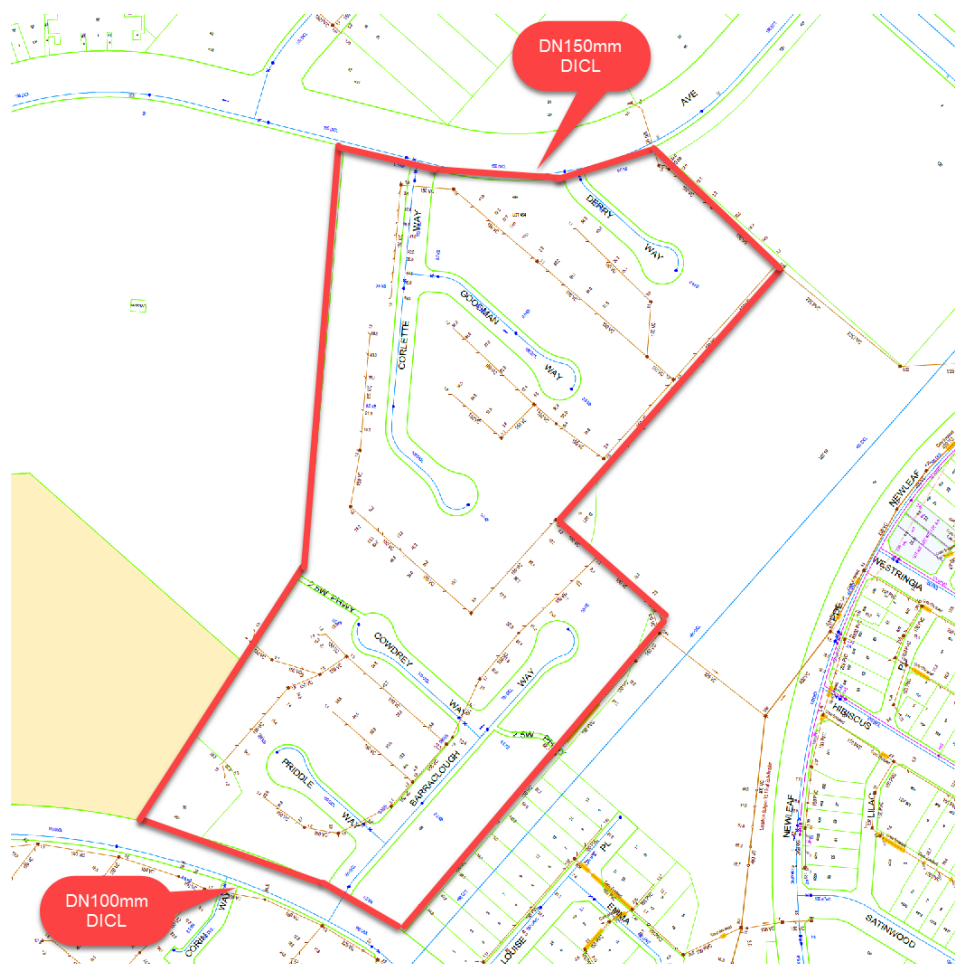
Hydra network – BYDA accessed 04/03/2022
